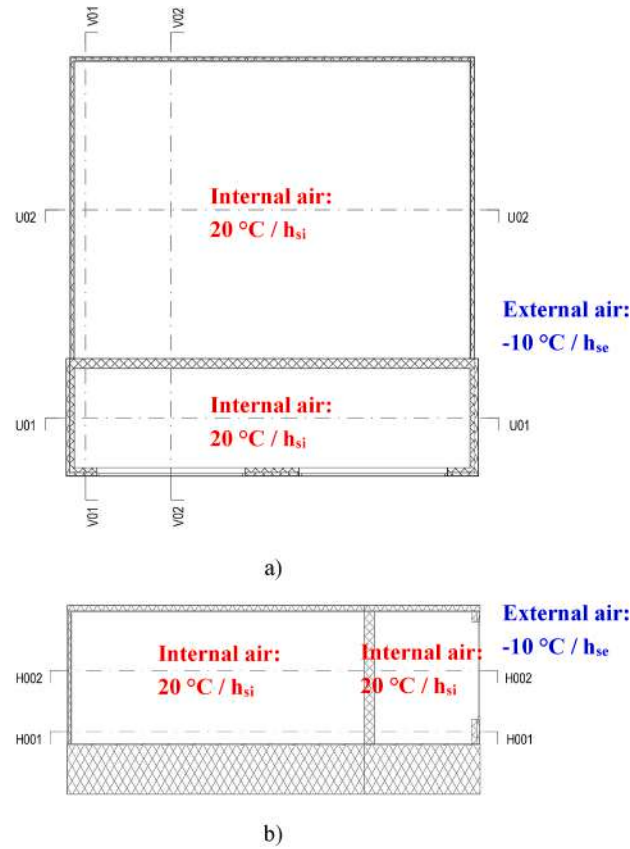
Simple building cross-section locations; a) vertical and b) horizontal.
